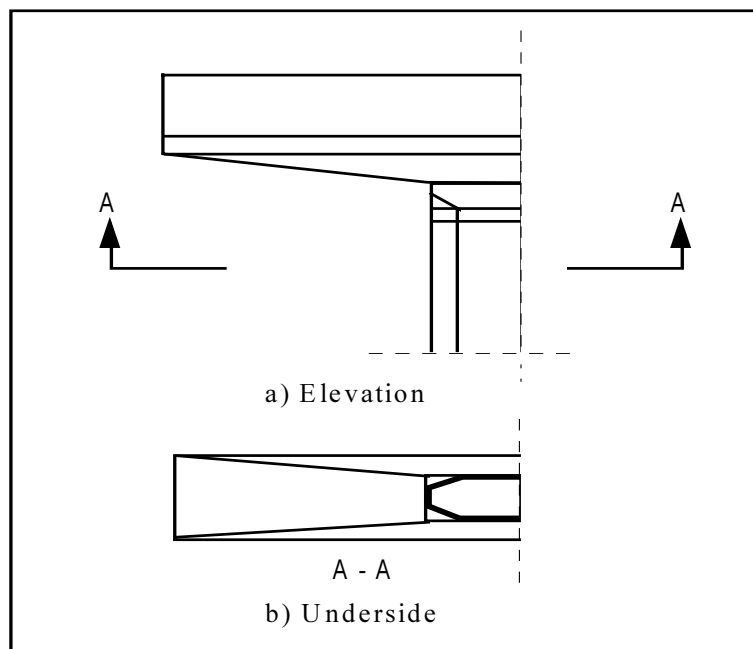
Inverted-T cap taper for Proposal I in elevation and plan
